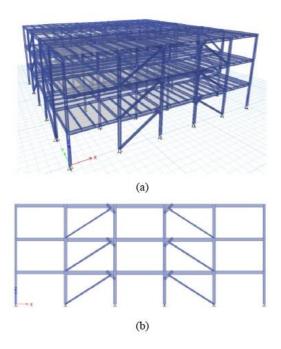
(a). 3D modelling of a full-scale building, (b) 2D frame of the building structure.
